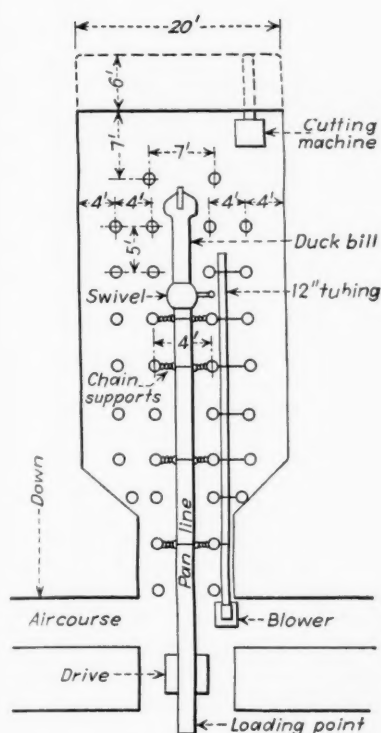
Timbering and equipment layout in a 20-ft. room.
